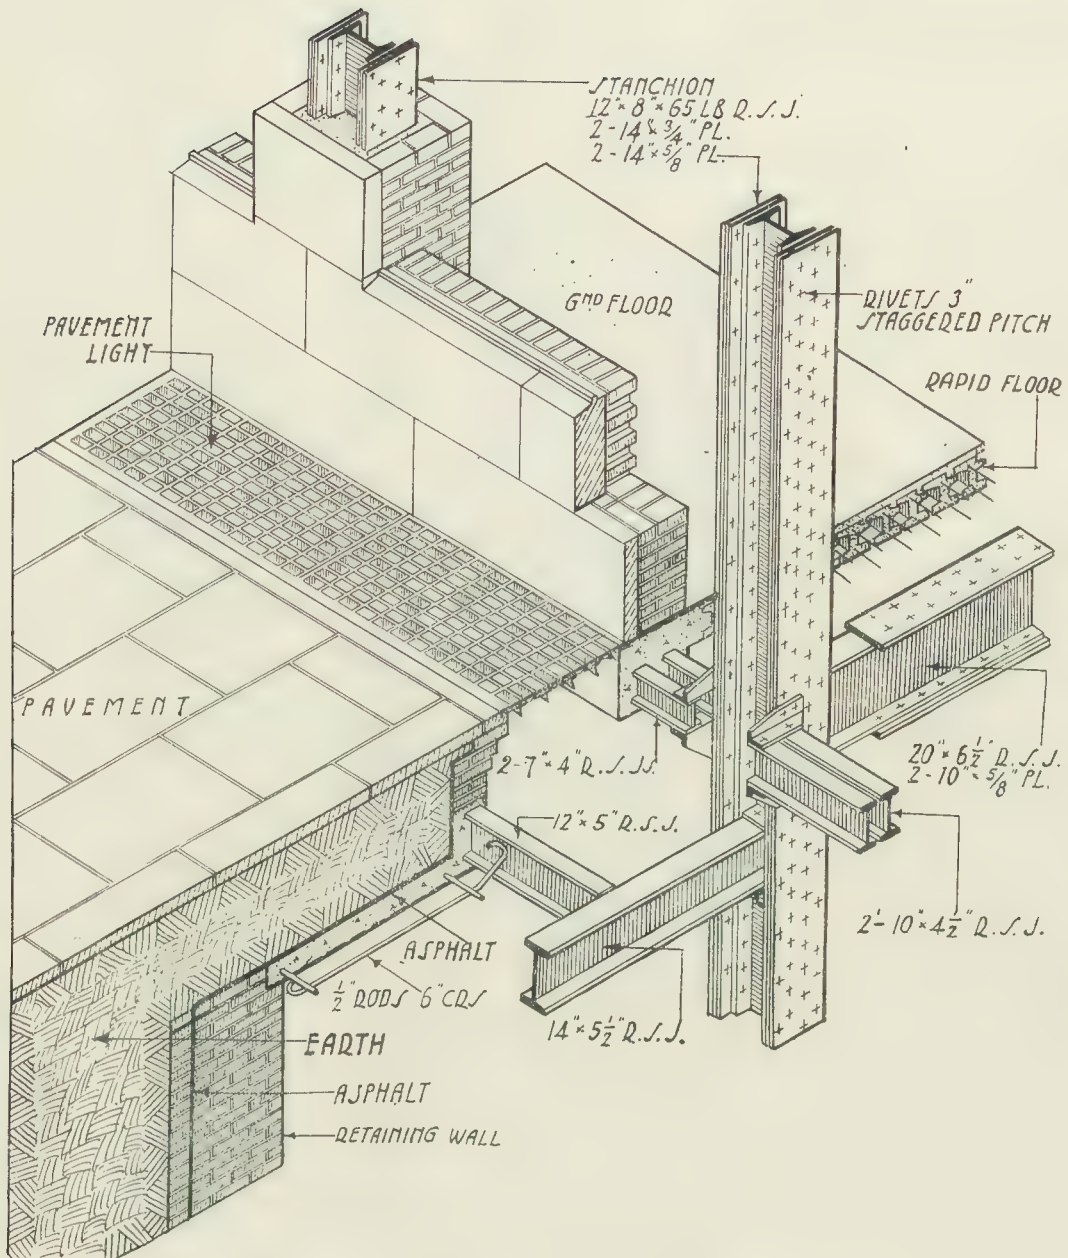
CONSTRUCTION OF EXTERNAL WALLS AT GROUND LEVEL.
